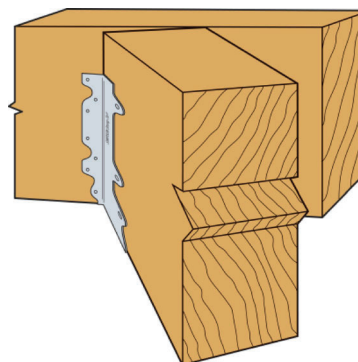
B—TYPICAL SUR HANGER INSTALLATION
